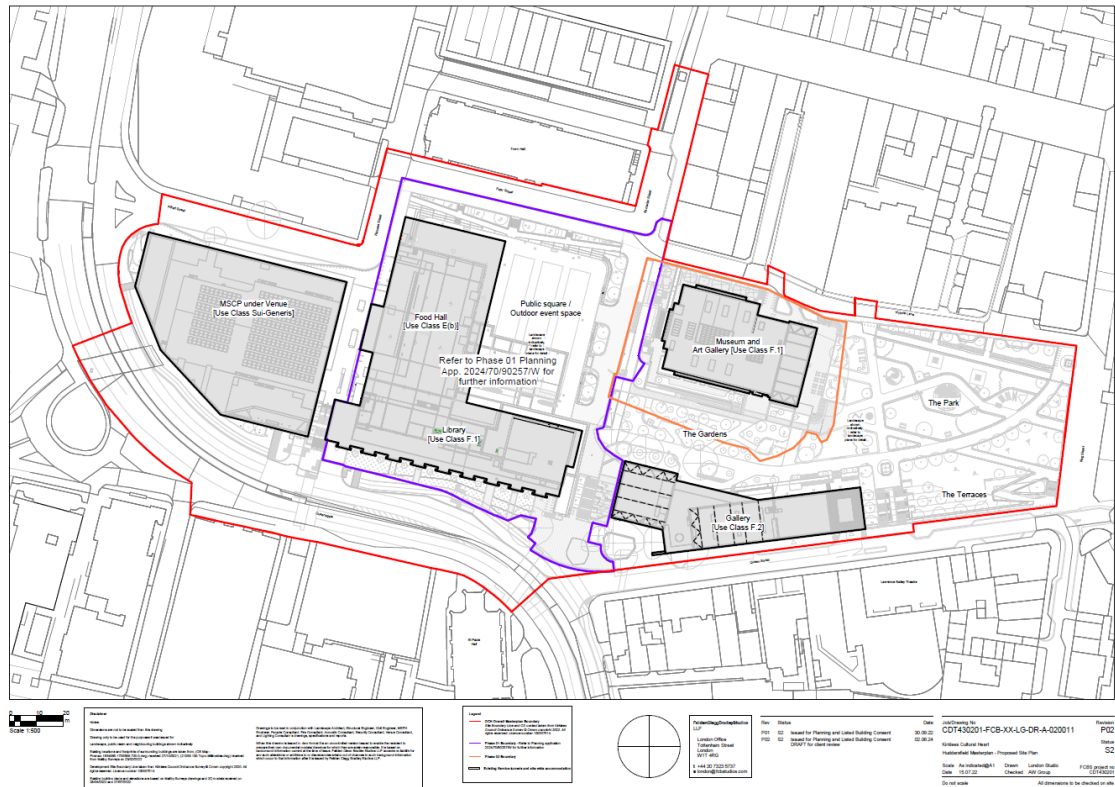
Site Location Plan – (orange boundary includes the Library and Art Gallery subject of the Section 73 application).
